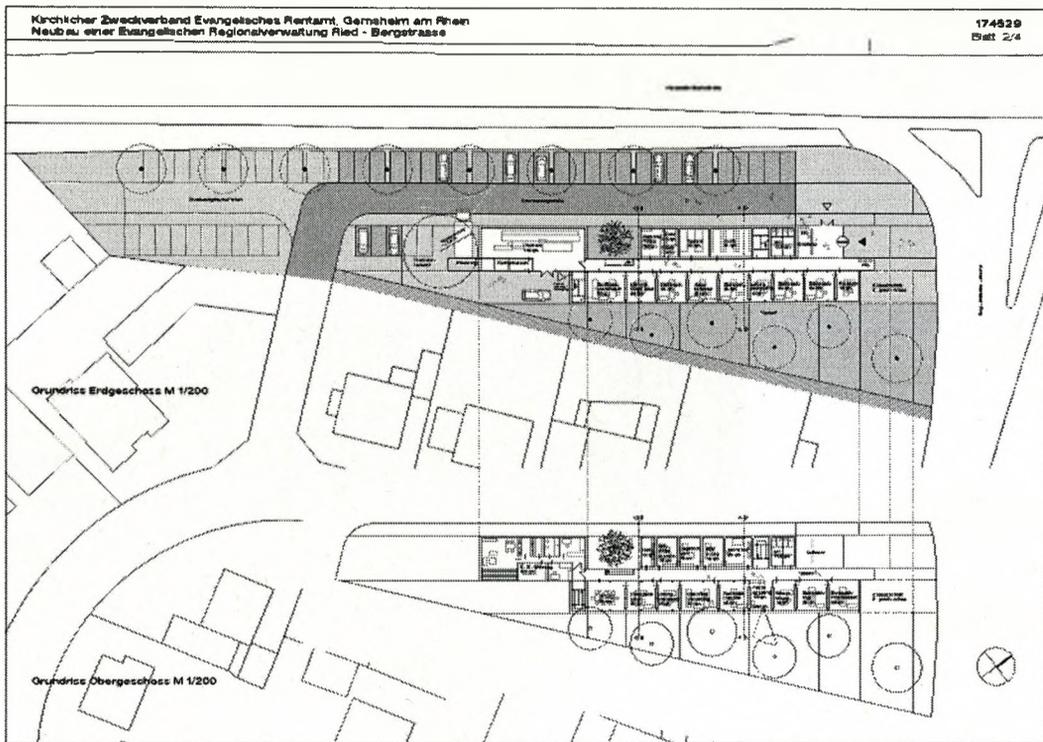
Gernsheim. Competition entry sheet 2. Floor plans (not to scale).
